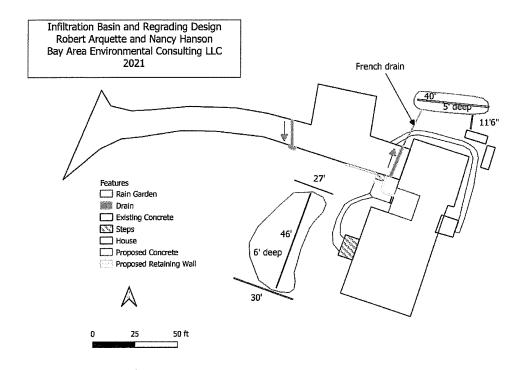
Proposed layout of stormwater infrastructure and concrete structures.
